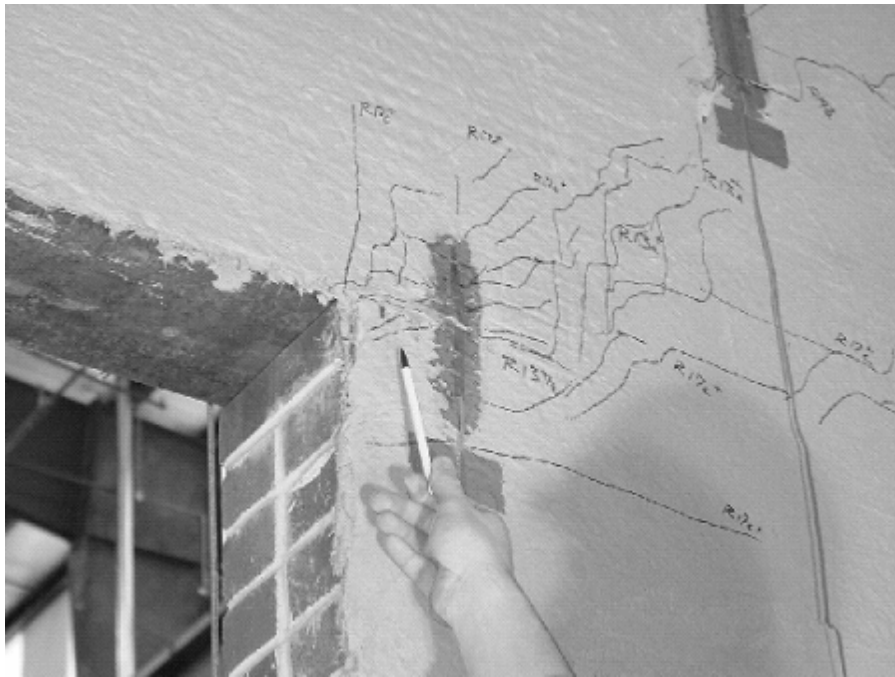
Photograph showing the damage to the external reinforcement applied to Wall 2 at pier P2-9 (taken during Test Run 19).
